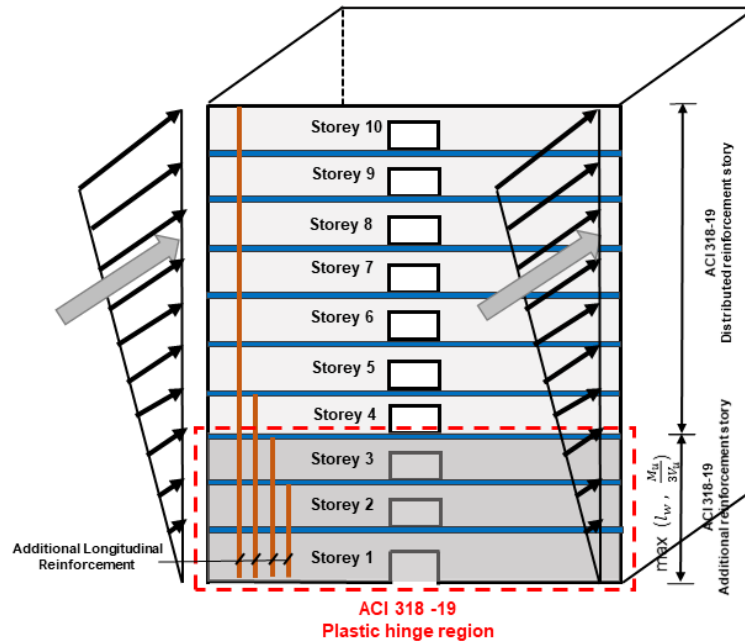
Loading protocol for a 10-storey core wall designed by ACI 318-19
